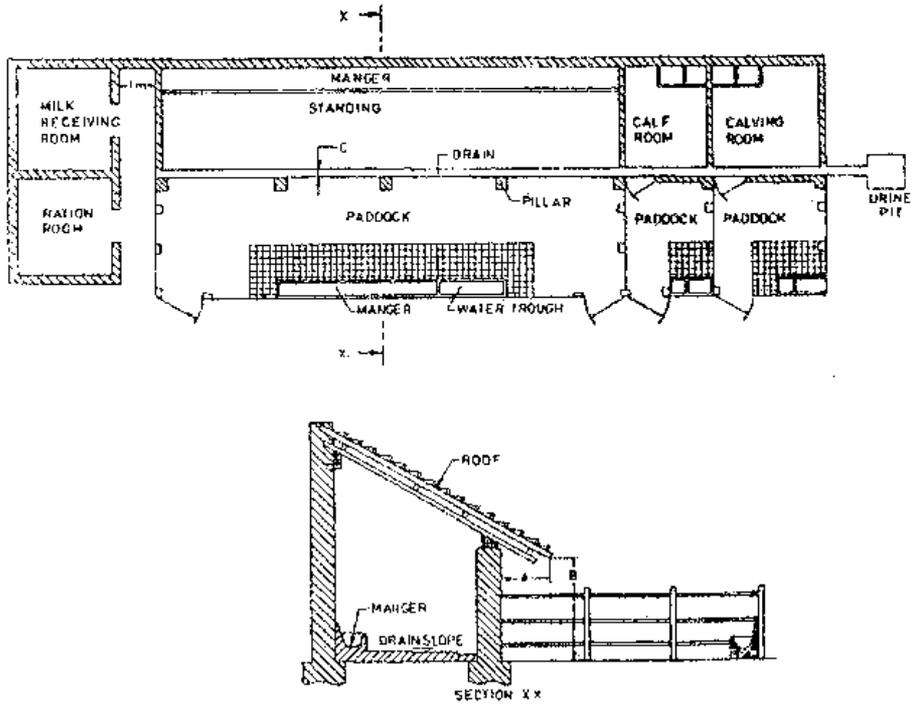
A TYPICAL LAYOUT OF SHED, LEAN-TO TYPE ROOF
